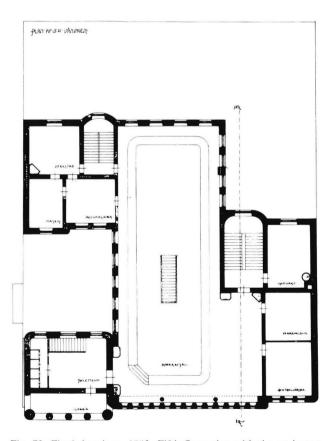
Final drawings, 1903. Fifth floor plan with the exchange hall. (HKRVVA).
